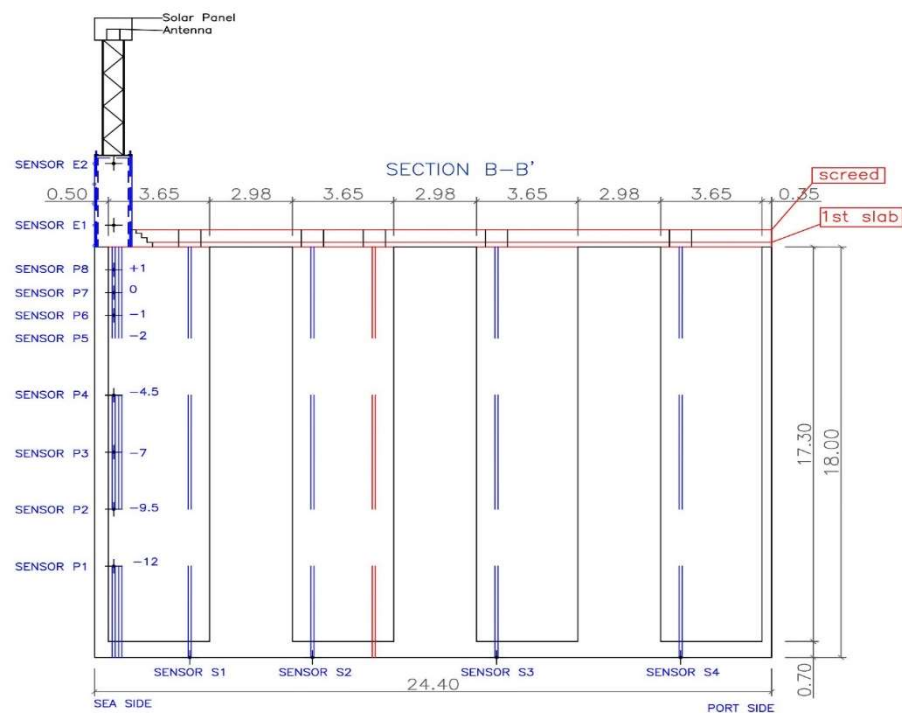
Location of the pressure transducers in the instrumented caisson.
